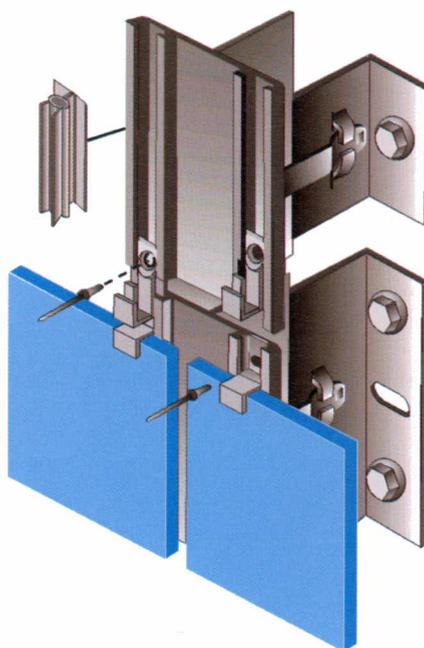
Visible coupling system (MIRAGE ENGINEERING, s.d.)
